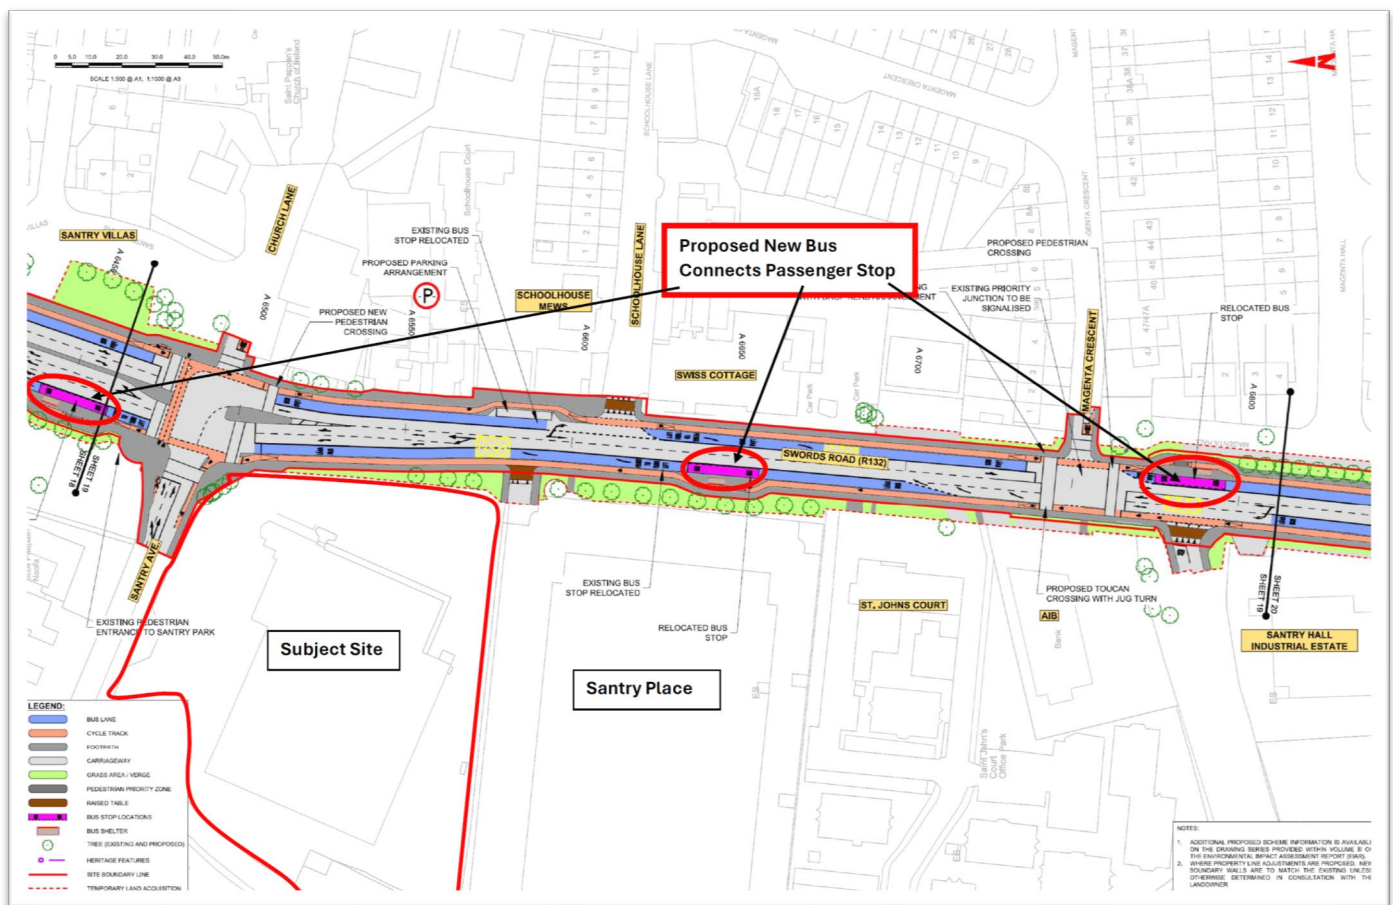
Extract from Swords to City Centre Core Bus Corridor Scheme General Arrangement Drawings, May 2023 (Drawing no. BCIDB-JAC-GEO\_GA-002\_XX\_00-DR-CR-0019 by Jacobs for NTA). Subject site is identified, indicatively outlined in red with 3 no. proposed bus stops on the Swords Road Core Bus Corridor identified in close proximity to the subject site i.e. within c.65m.
